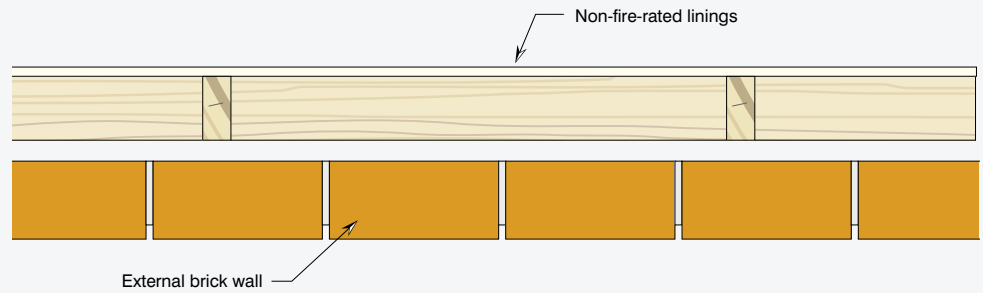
Fire-rated external brick veneer wall systems (outside only) – plan view.
